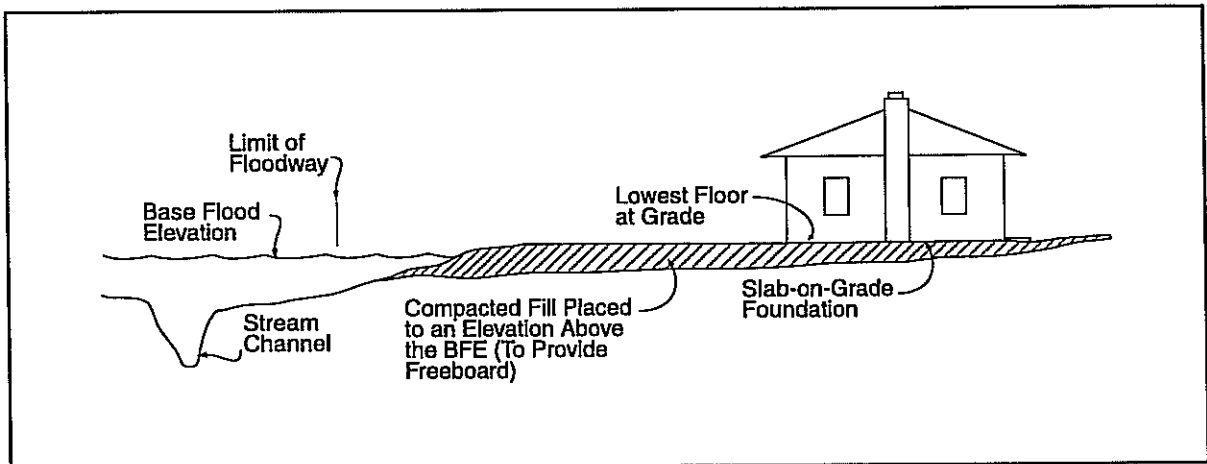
Structure on a slab-on-grade foundation. The lowest floor is typically slightly higher than the surrounding grade.
